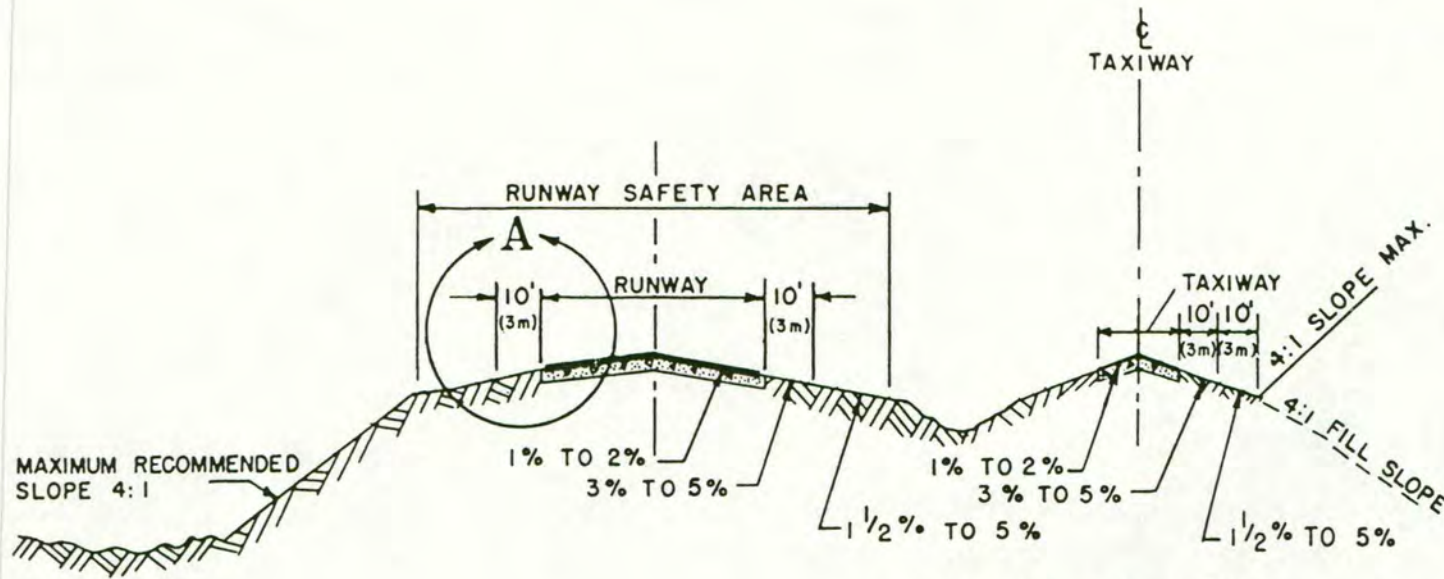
depicts a typical cross section of the runway and taxiway configuration.
